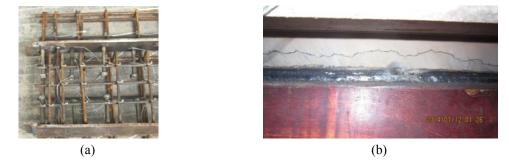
Layout of the PSS connector and the welded joint
